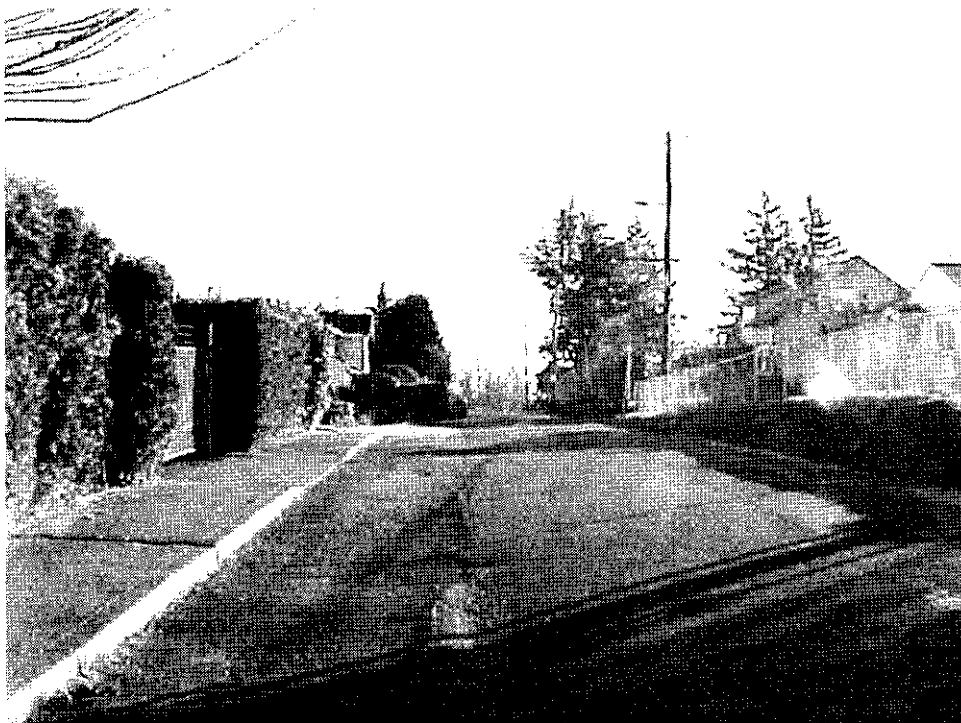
Looking East along Dewey Street from the intersection of Dewey and Molalla Avenue
